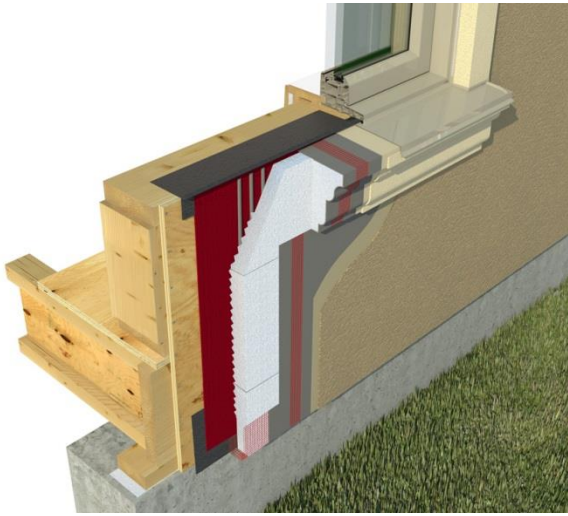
“Adex-RS” system with a water penetration barrier over plywood/OSB
